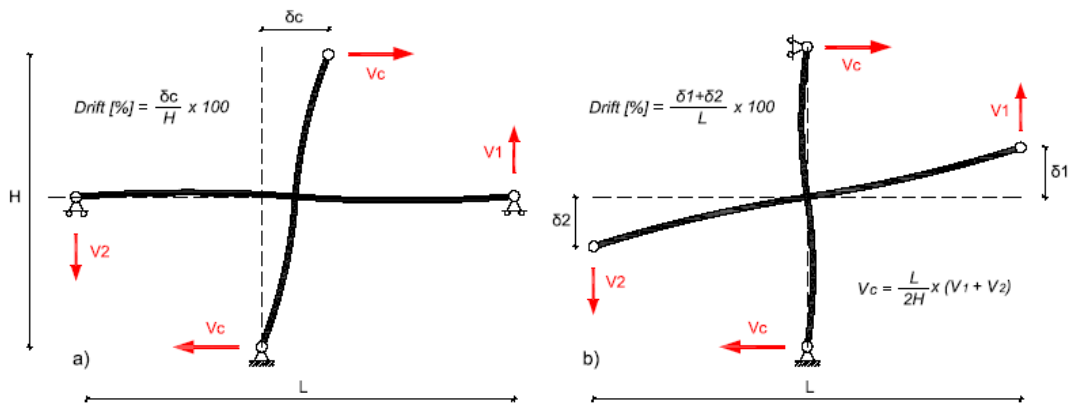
Drift expression and cyclic forces applied. a) on columns, b) on beams
